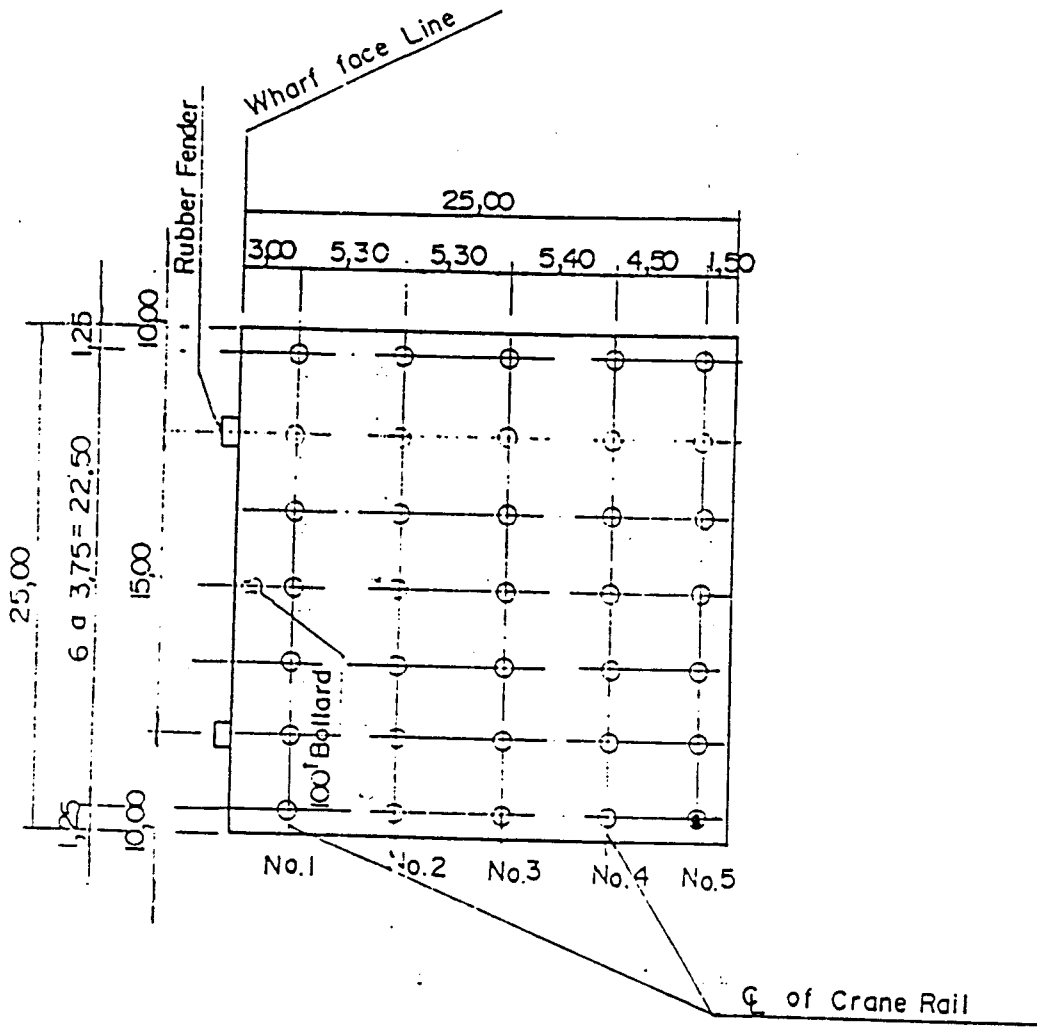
(1)-6 Arrangement of Piles and Accessory Facilities
